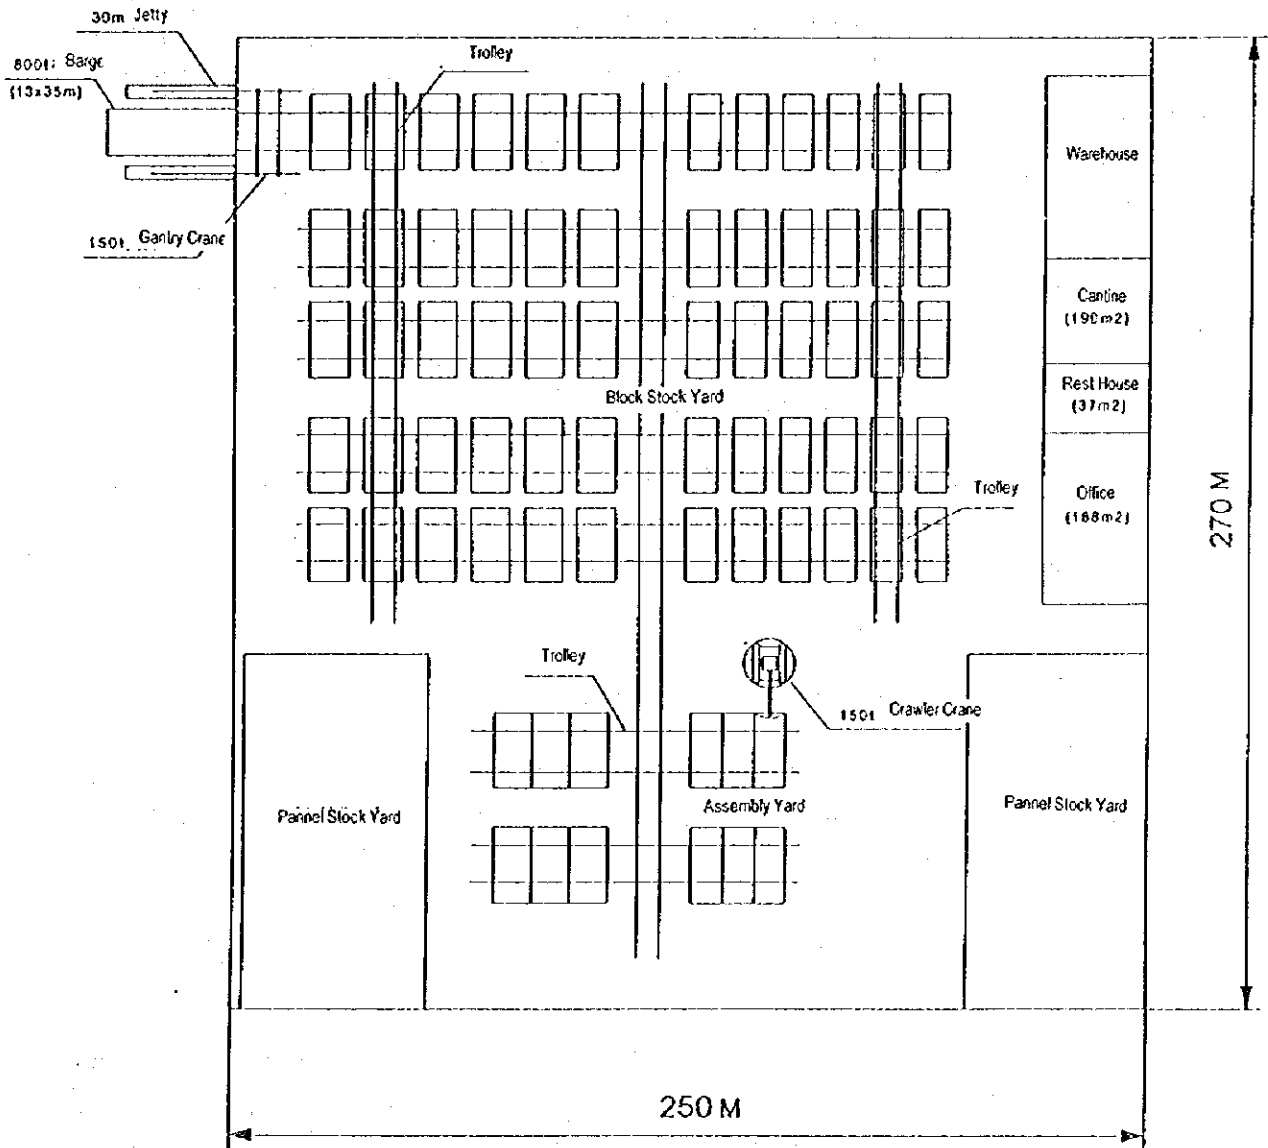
(3) Site Work Yard (Assemble Yard)
